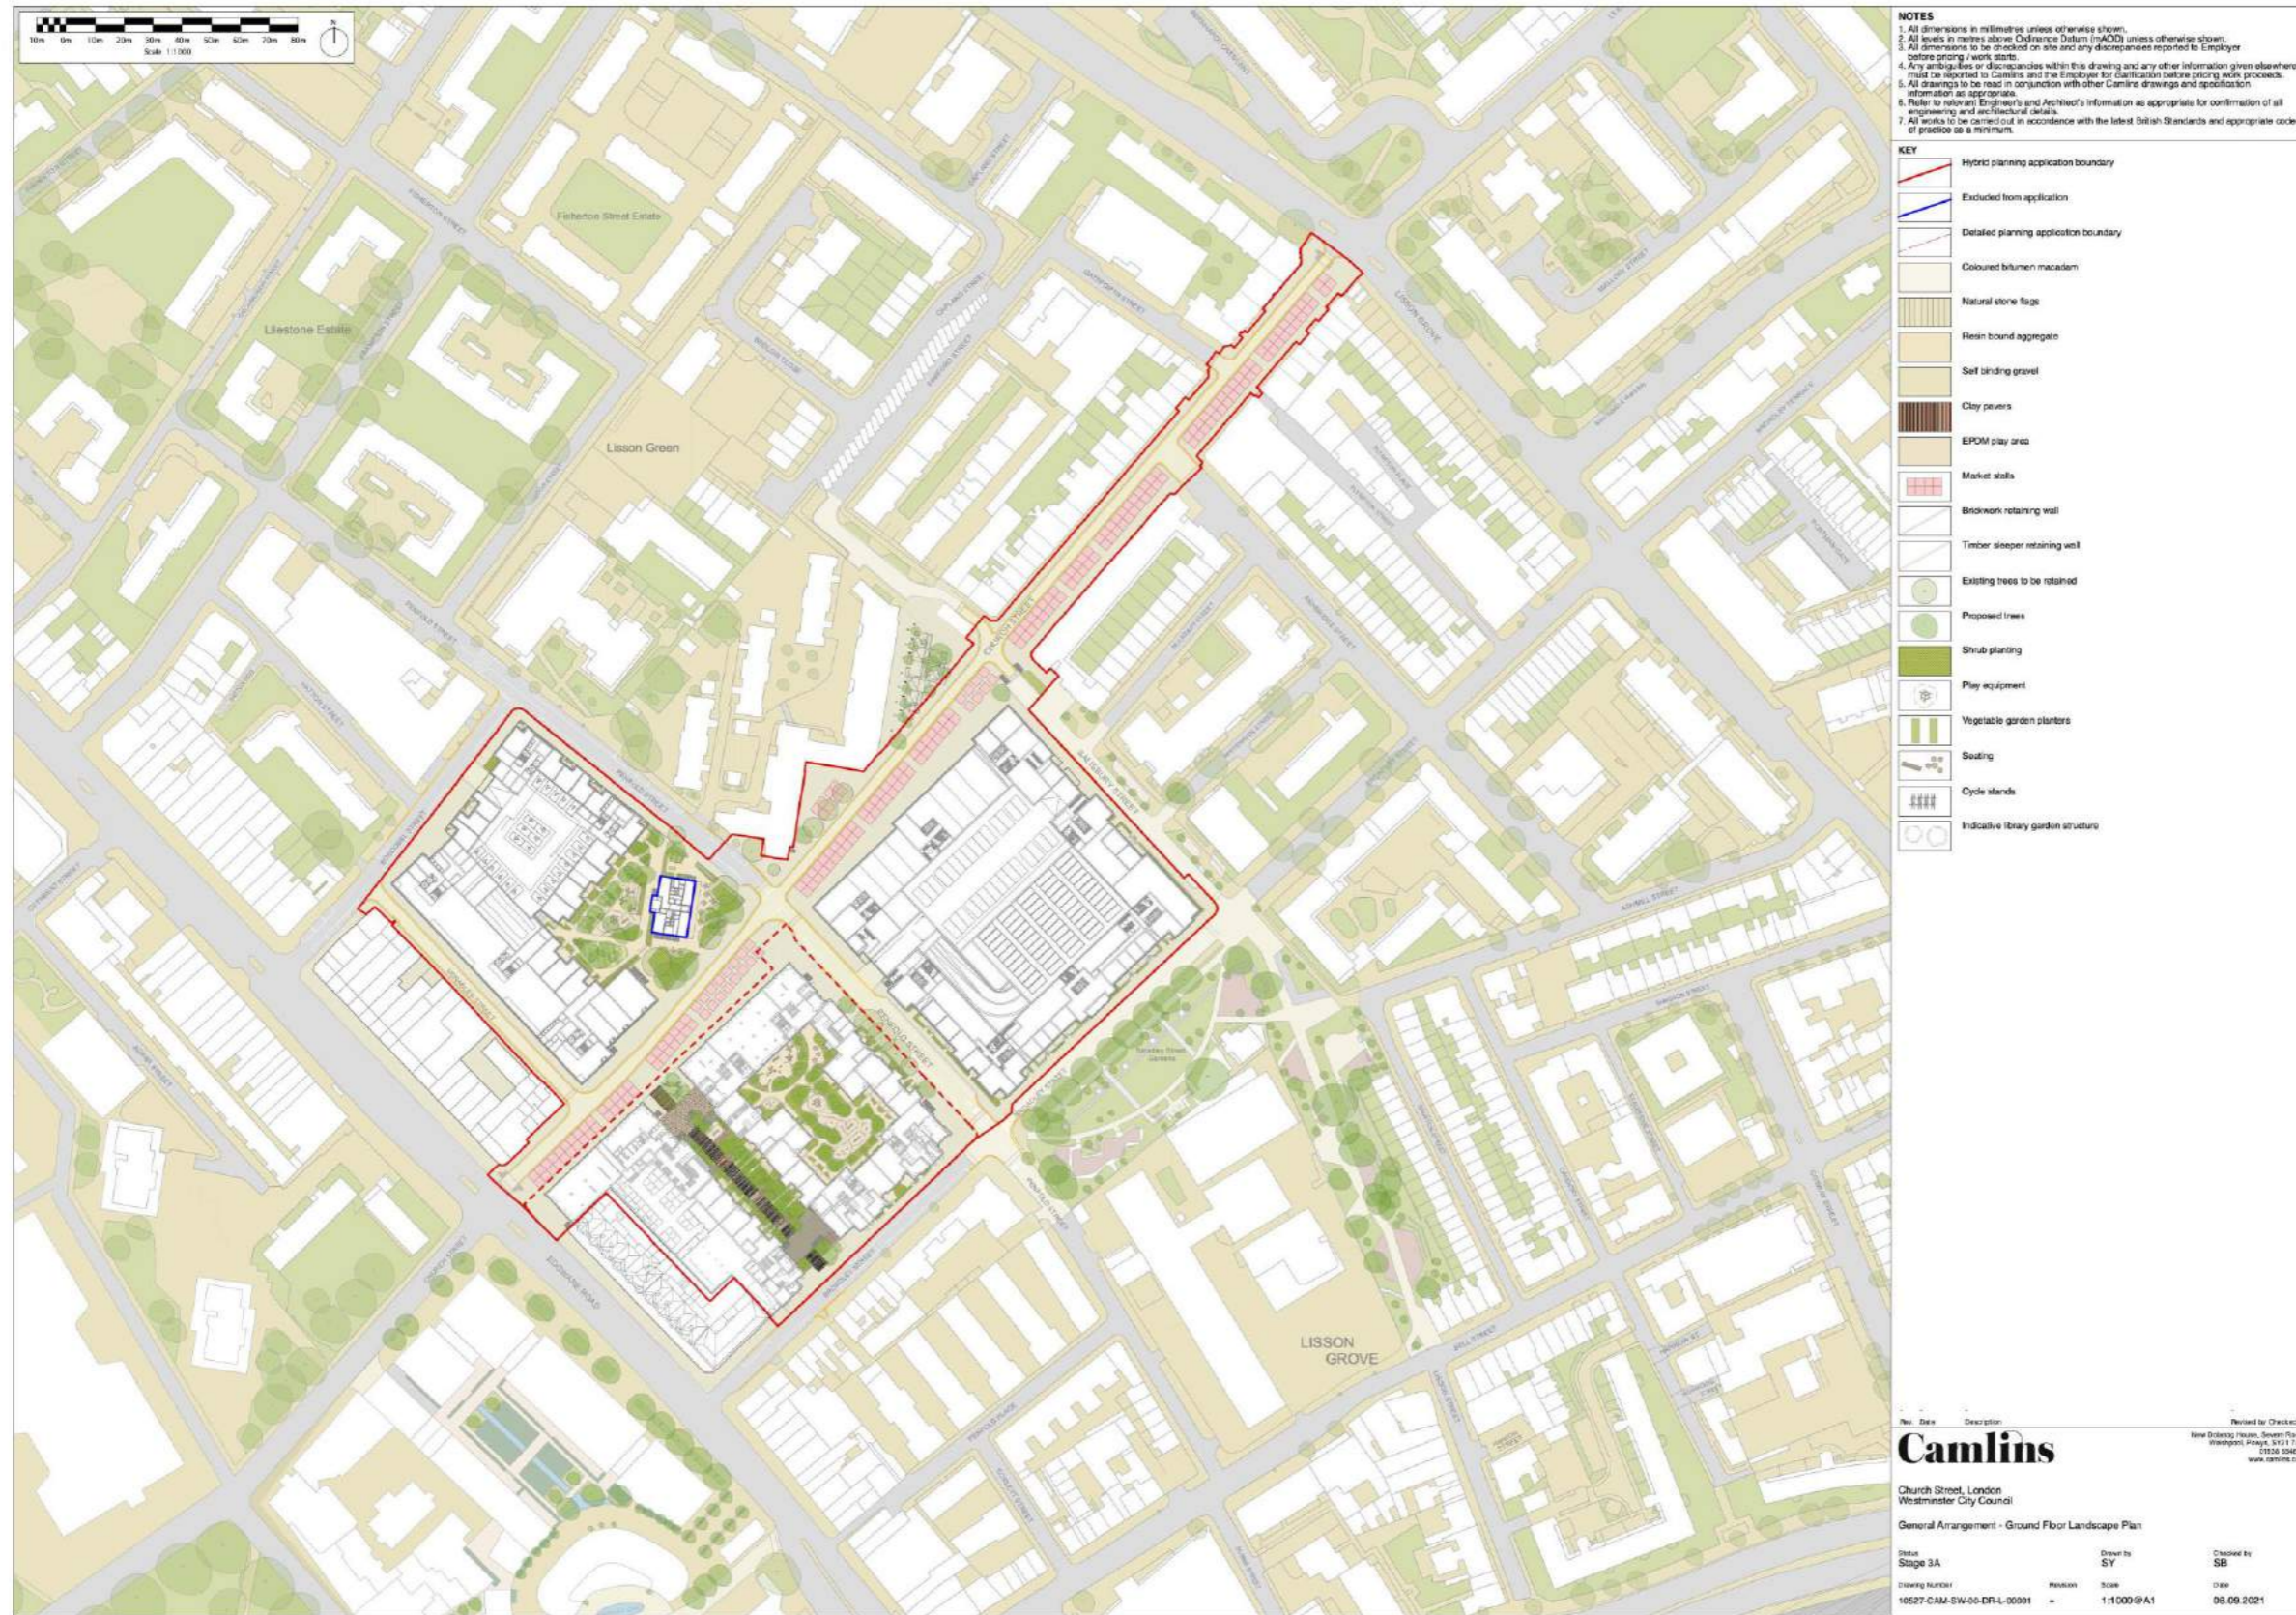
Site A Detailed Landscape Ground Floor Masterplan
